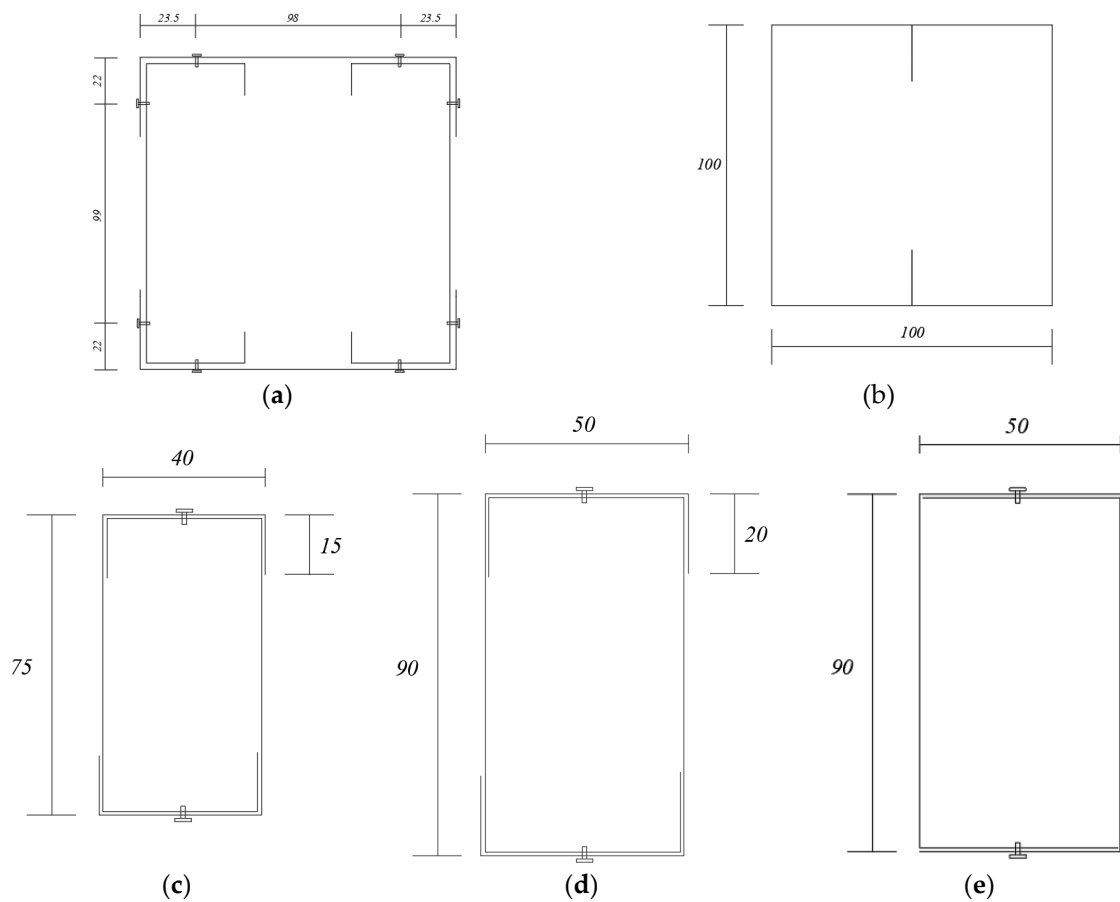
CFS-FTF built-up cross-section shapes: (a) FTF gapped built-up section [13,14]; (b) FTF lip connected built-up section [15]; (c) FTF flange connected built-up section [2]; (d) FTF built-up lipped channel section; and (e) FTF built-up unlipped channel section.
